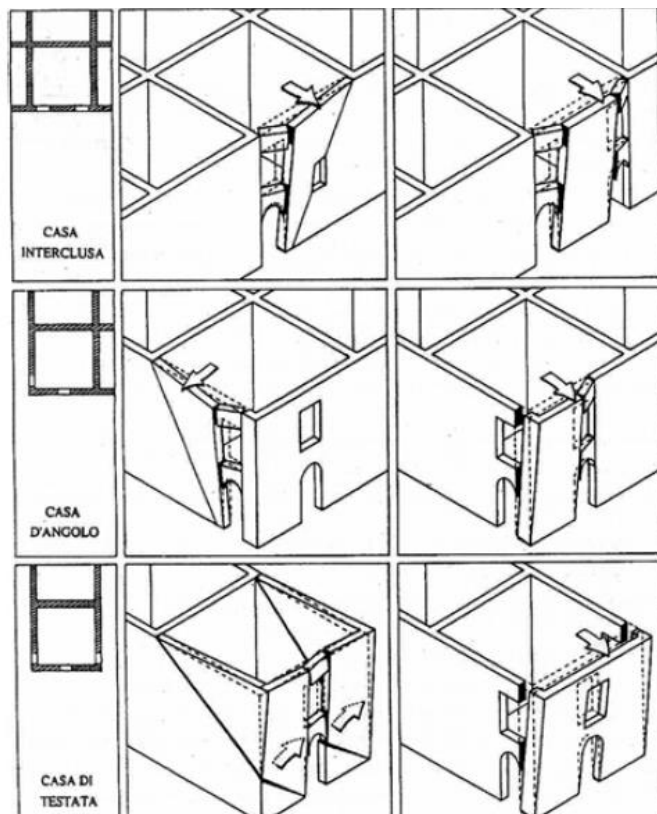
Damage mechanism for row buildings (Giuffrè 1993)
